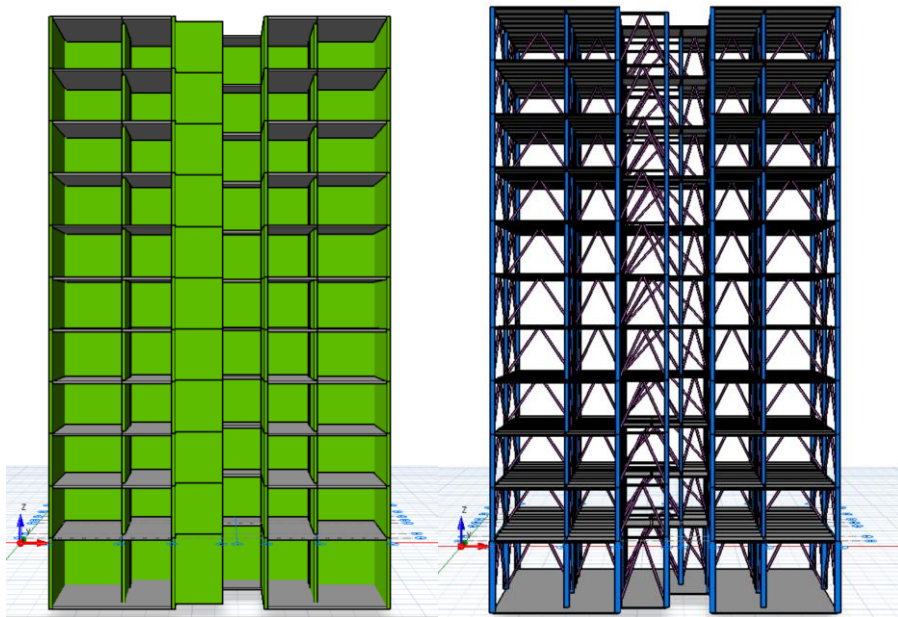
10-Story Reinforced Concrete Model (left) and 10-Story Steel Model (right)
